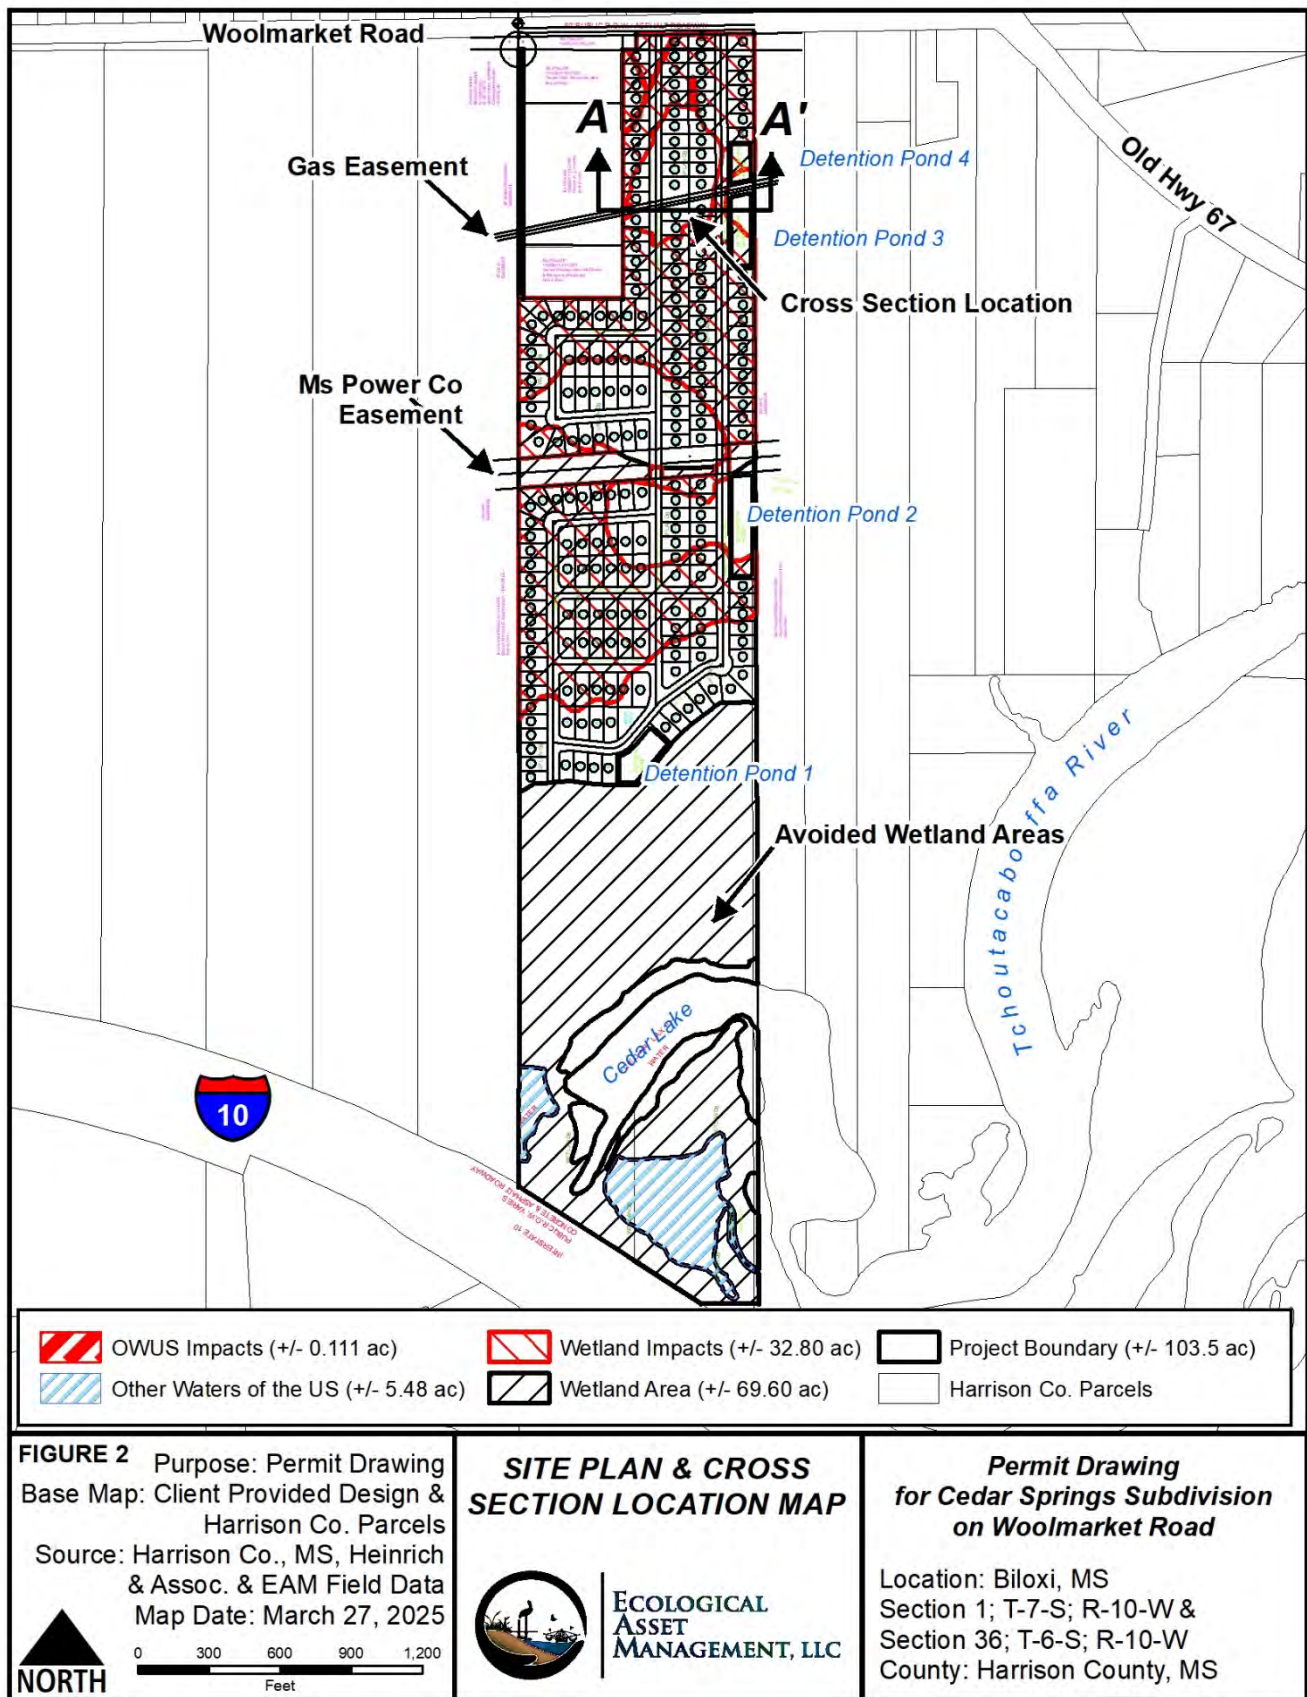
Cedar Springs Subdivision Site Plan & Cross Section Location Map
